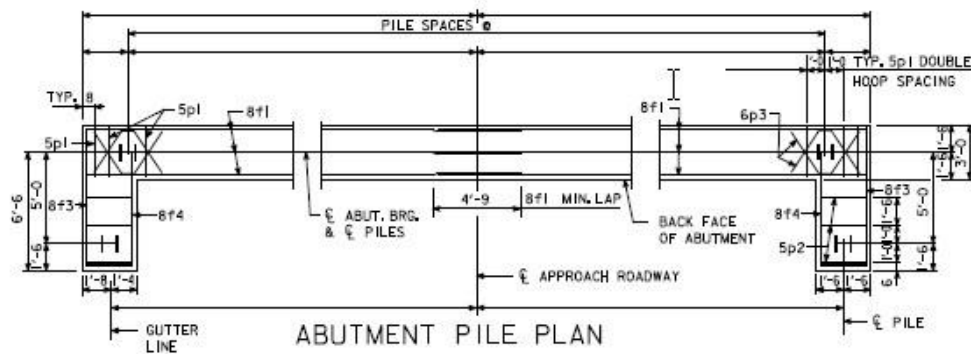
Plan View of a Typical Integral Abutment (Iowa DOT 2011)
